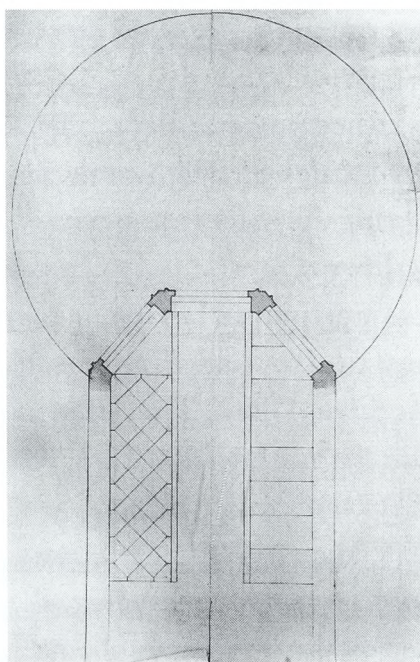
John Hallam, plan of the east end of the cold bath and summer house as built, 1728. *Nottinghamshire Archives.
